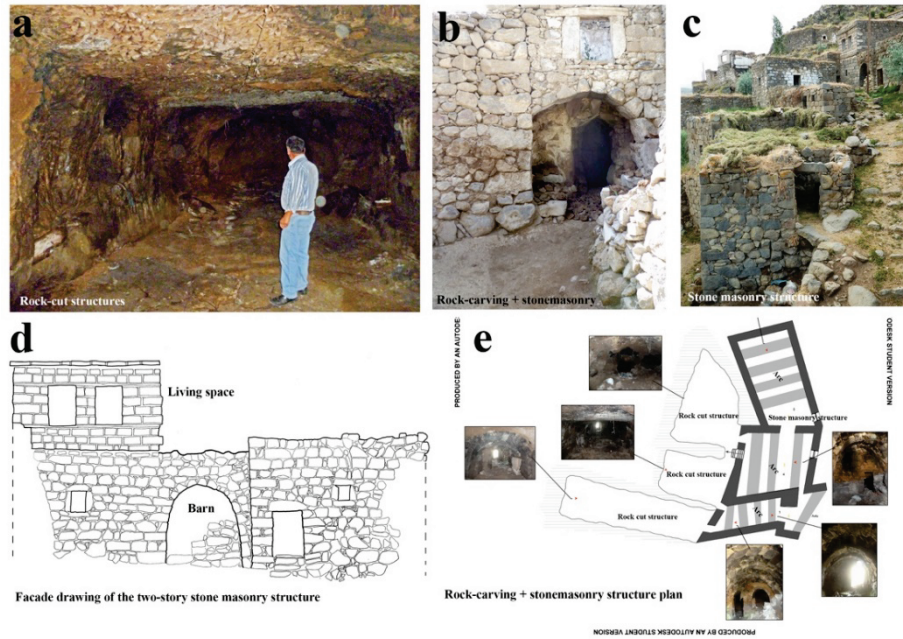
(a) Rock-carved structures (b) Rock-carved and stone masonry structures (c) Stone masonry structures (d) Frontal view of a stone masonry structure (e) Plan of a rock-carved and stone masonry structure.⁹³
